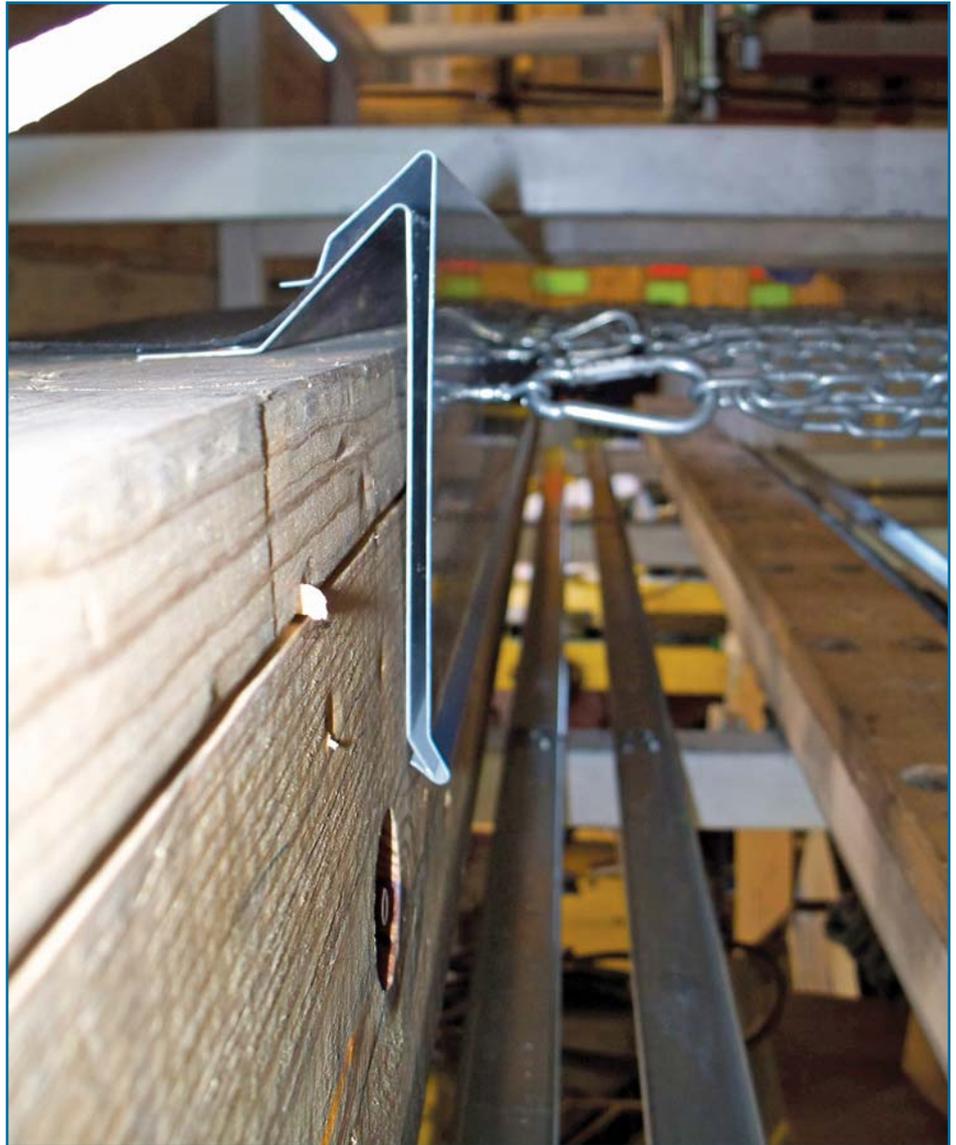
RE-2 pull-off test for edge flashing. Photo courtesy of Hurricane Test Laboratory and IMETCO.
